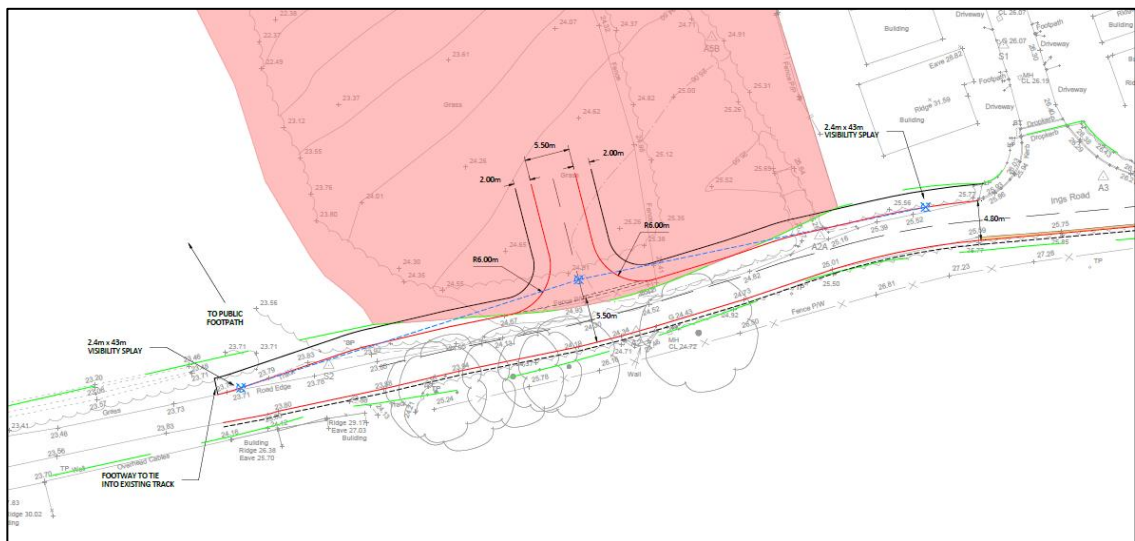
Extract from Appendix B of Transport Statement (Site Access Proposals – Not To Scale)
